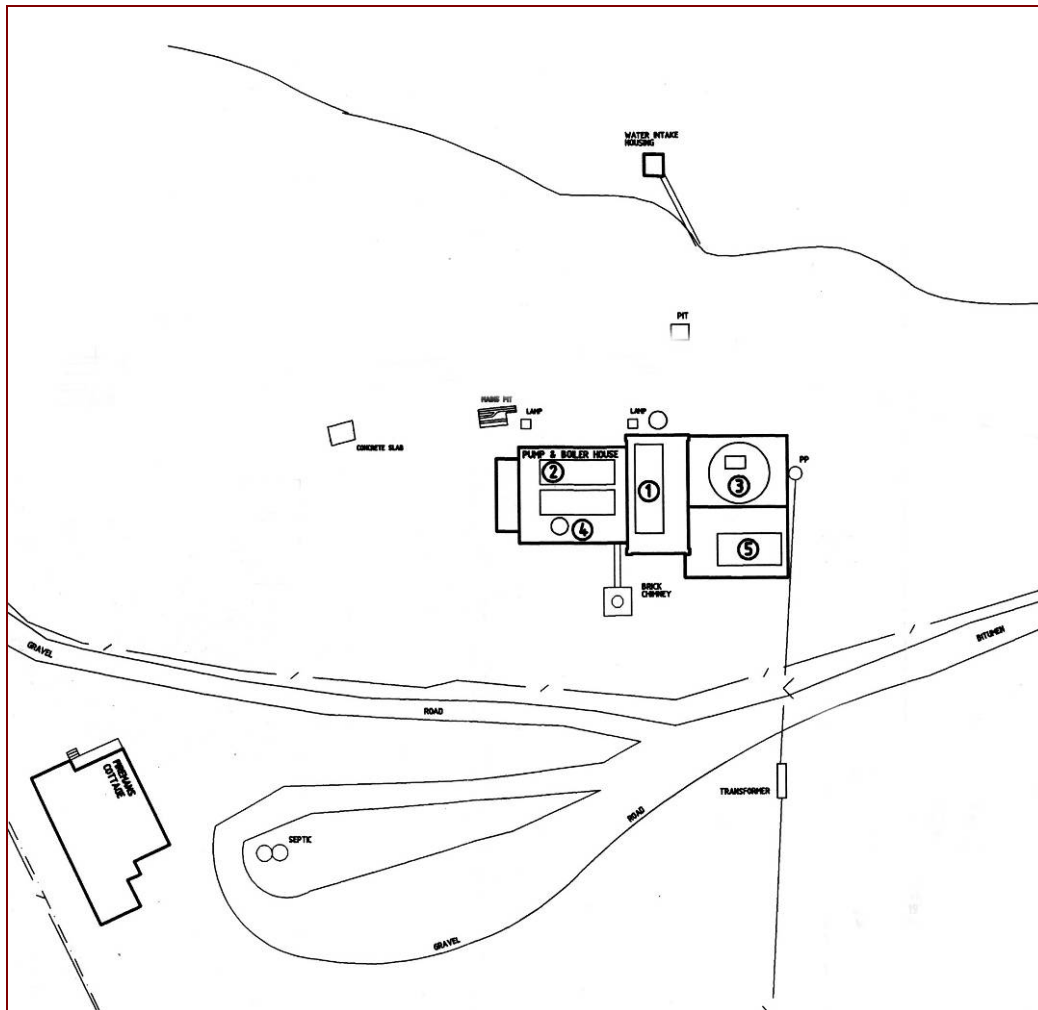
Survey Plan of the Goulburn Waterworks site (this plan is based on an earlier plan Garry Dutallis & Associates, 1996).
